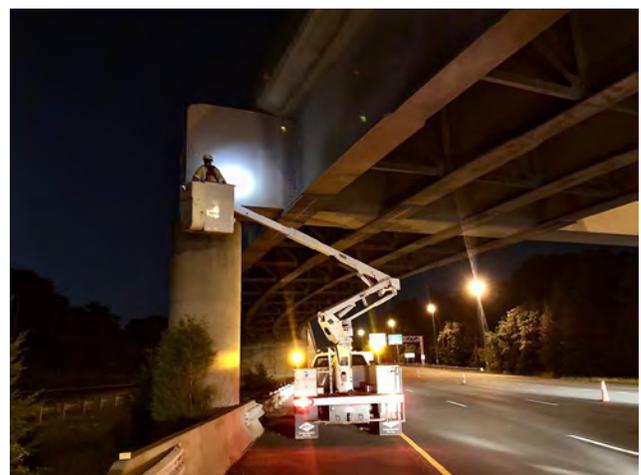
In-depth inspection will be completed by the Team to identify repairs on the Route 33 overpass bridge.
